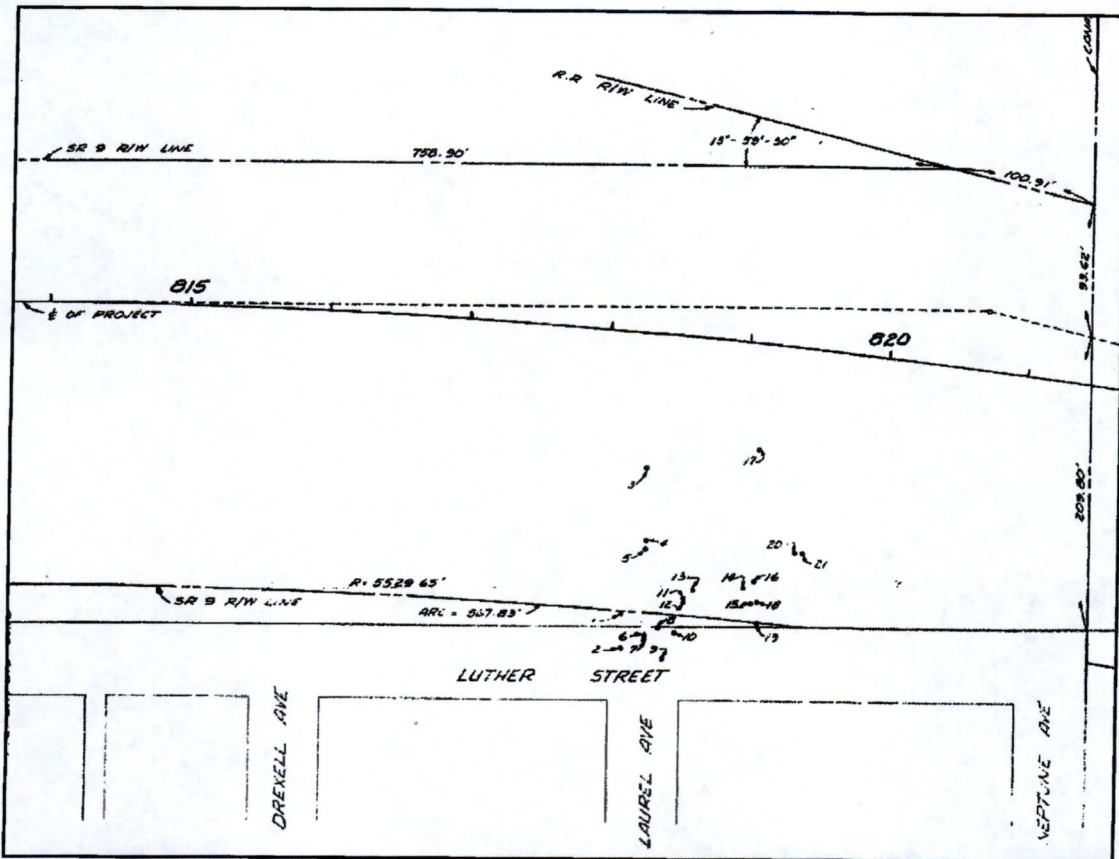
State Road 9, Chapel Hill Cemetery, Palm Beach County Engineering Department (1968)
